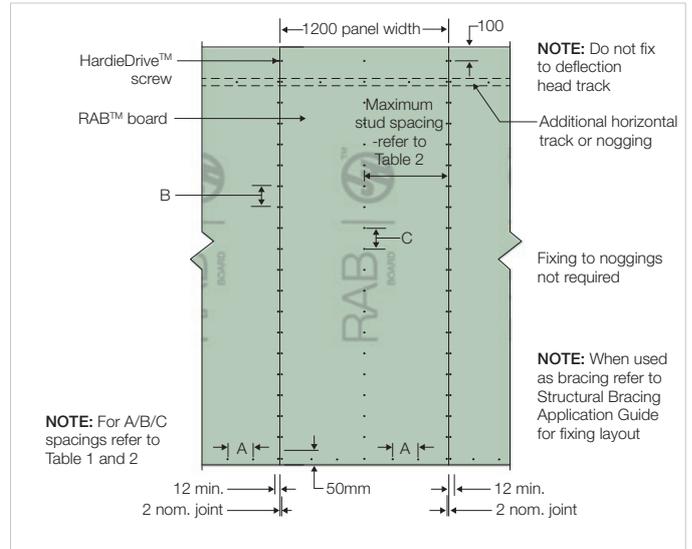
FIXING LAYOUT FOR STRUCTURAL BRACING
